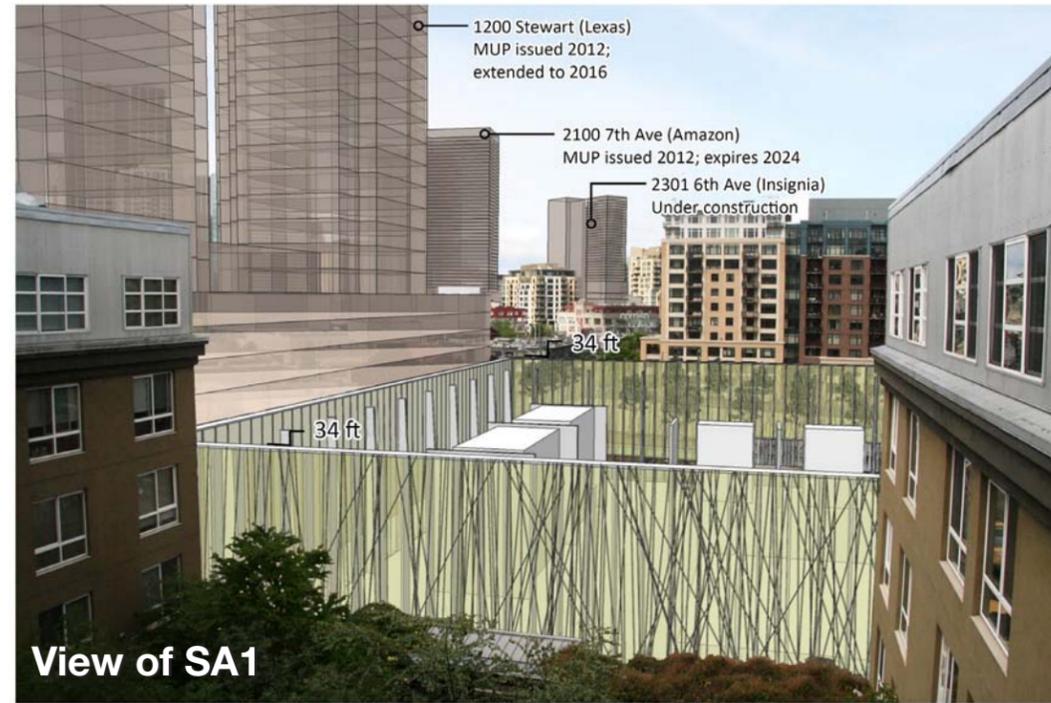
Building View ④ of Proposed Substation from Mirabella
